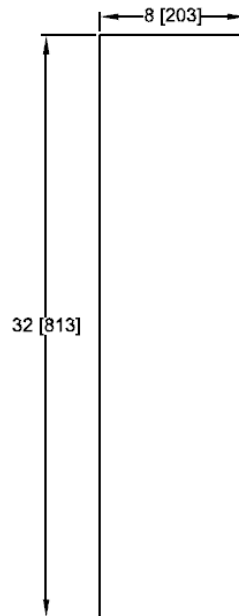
Vertical PCB Profile Dimensions in. (mm) [10]
